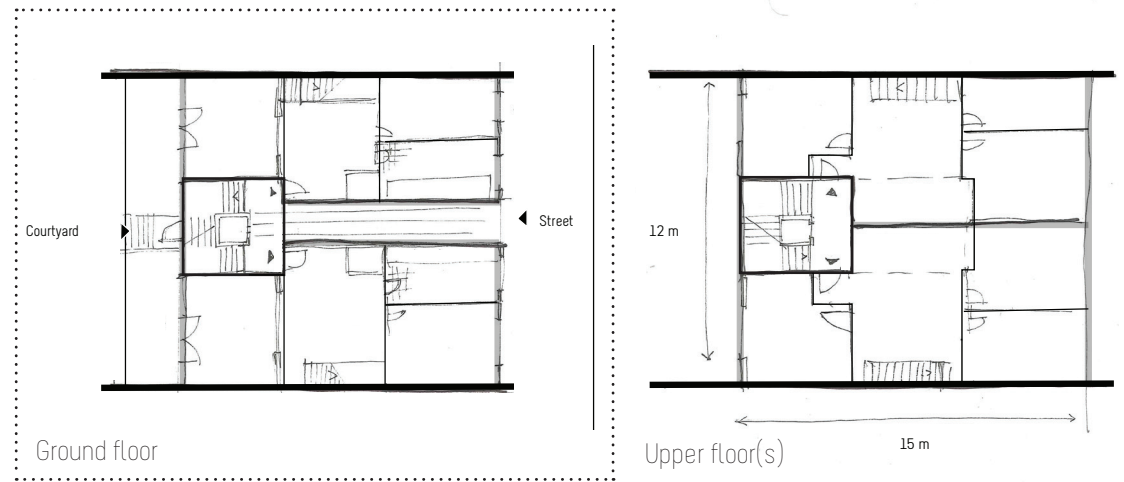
Sketches of the proposed maisonnettes as a part of the typologies in the building blocks
